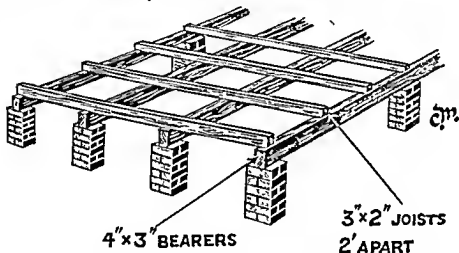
C.—CONSTRUCTION OF FLOOR FOR PERMANENT HOUSES
